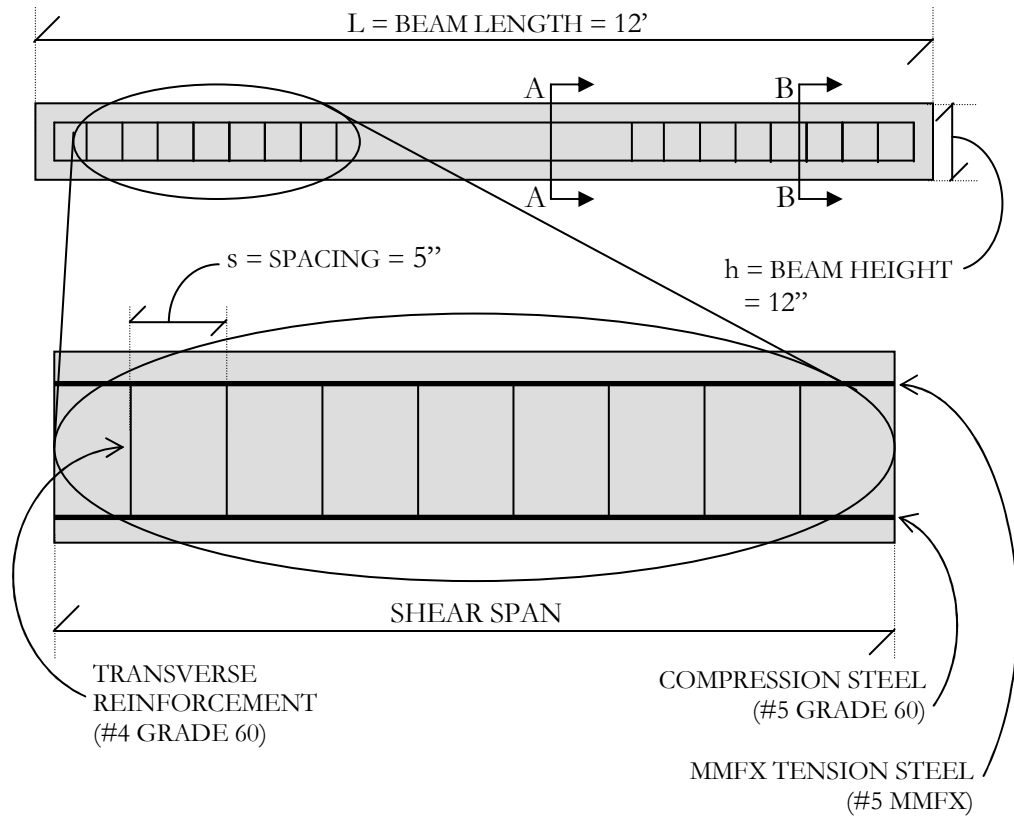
Elevation View of Beam and Close-Up of Shear Span
